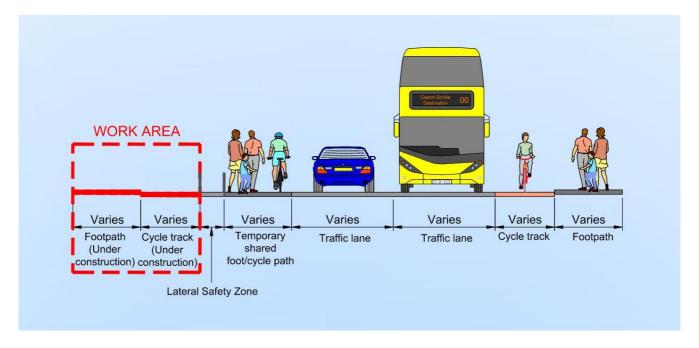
Traffic Management Cross Section, Section 3b Clanbrassil Street Upper / Lower - Stage 1
